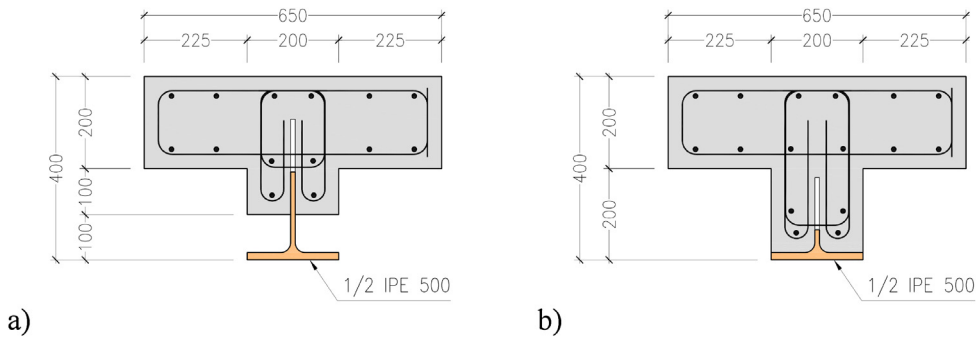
Cross sections of the beams subjected to laboratory tests. (a) beam B1, (b) beam B2.
